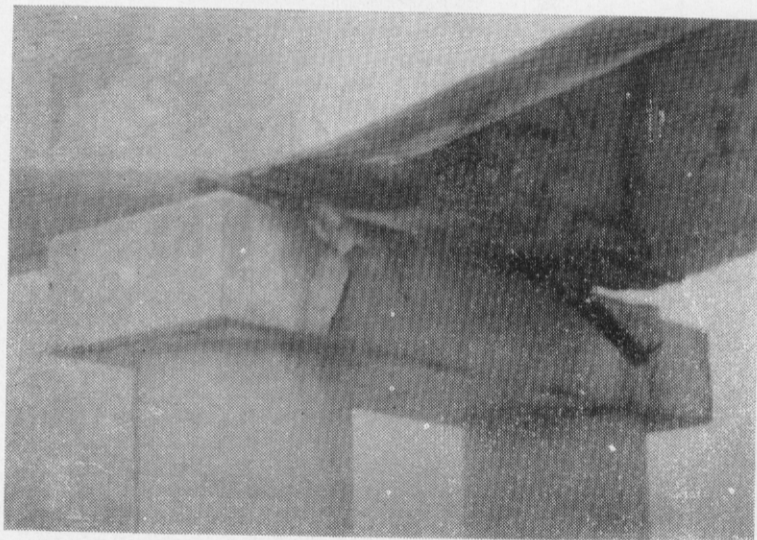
Dislodging of timber bridge's vertical support, nearest to RCC deck, from their position by about 60 cm in the direction longitudinal to the bridge.
